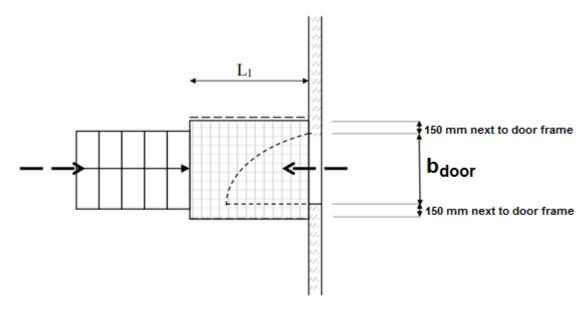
, dimensions of the platform and railing at a door that opens over the platform
